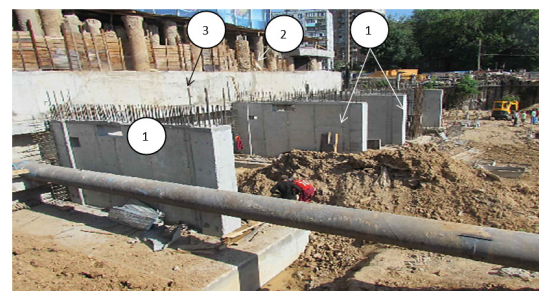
Fragments of completed monolithic reinforced concrete buttresses: 1 - monolithic reinforced concrete buttresses; 2 - existing pit fencing made of bored piles; 3 - finished pit fencing made of monolithic reinforced concrete; 4 - steel pipe (bulk)
